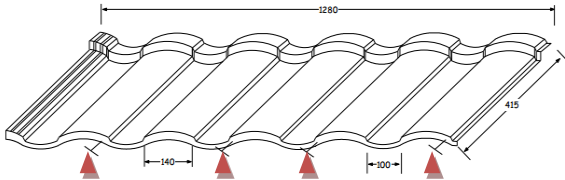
METROTILE® SHAKE tile - position of fasteners
